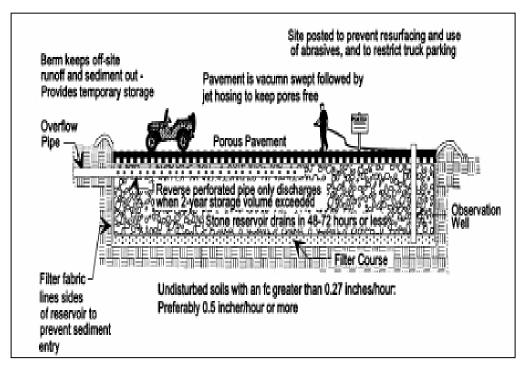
Typical Section of Porous Pavement with Buried Stone Reservoir
